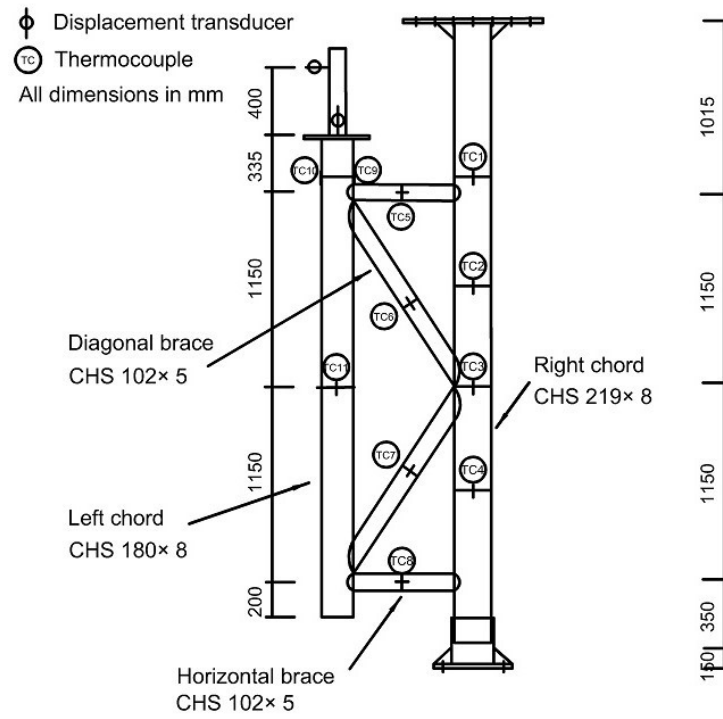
Steel tubular truss test set-up (Liu et al. 2010)
